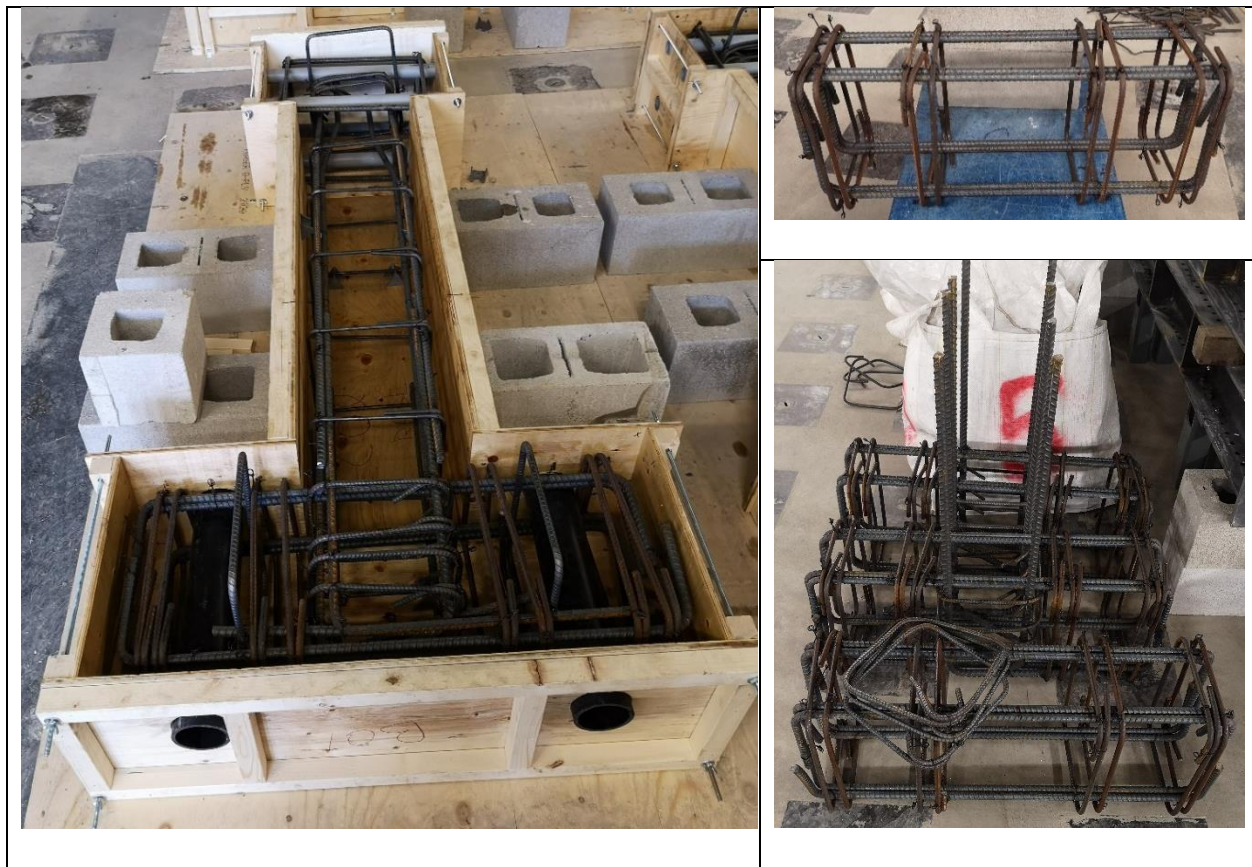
Column reinforcement cage preparation. Full column placed in formwork ready for casting (left), footing cage (right)
